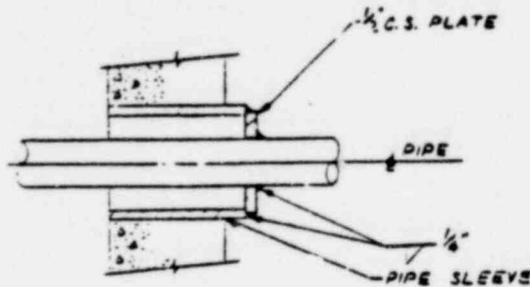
TYPICAL PENETRATION ANCHOR DETAIL 1145 259
